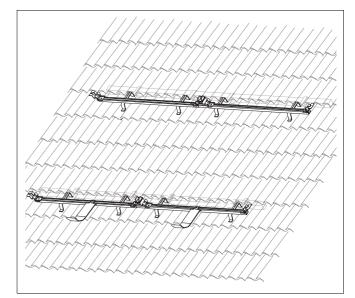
Profile rails with roof hooks installed on a tile roof – for two adjacent collectors
